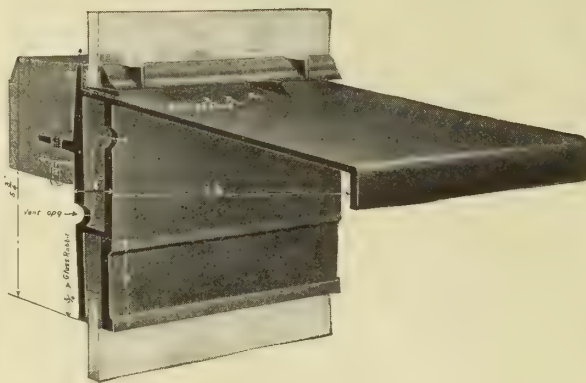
SECTIONS AND DETAILS OF STORE FRONT CONSTRUCTION
